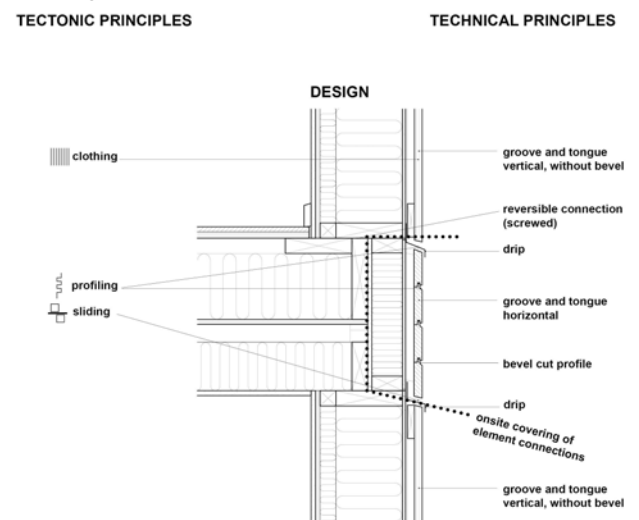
Vandkunsten 2007 Kvistgård, façade detail.
